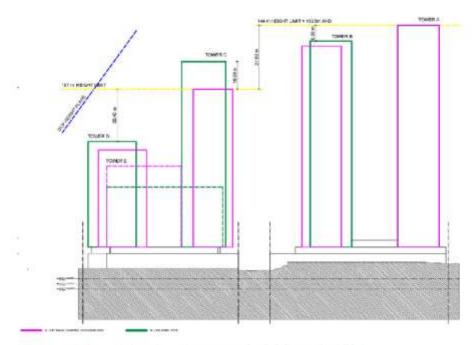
Gateway PP building forms viewed from corner Belmore & Burwood Rds. (heritage item)
